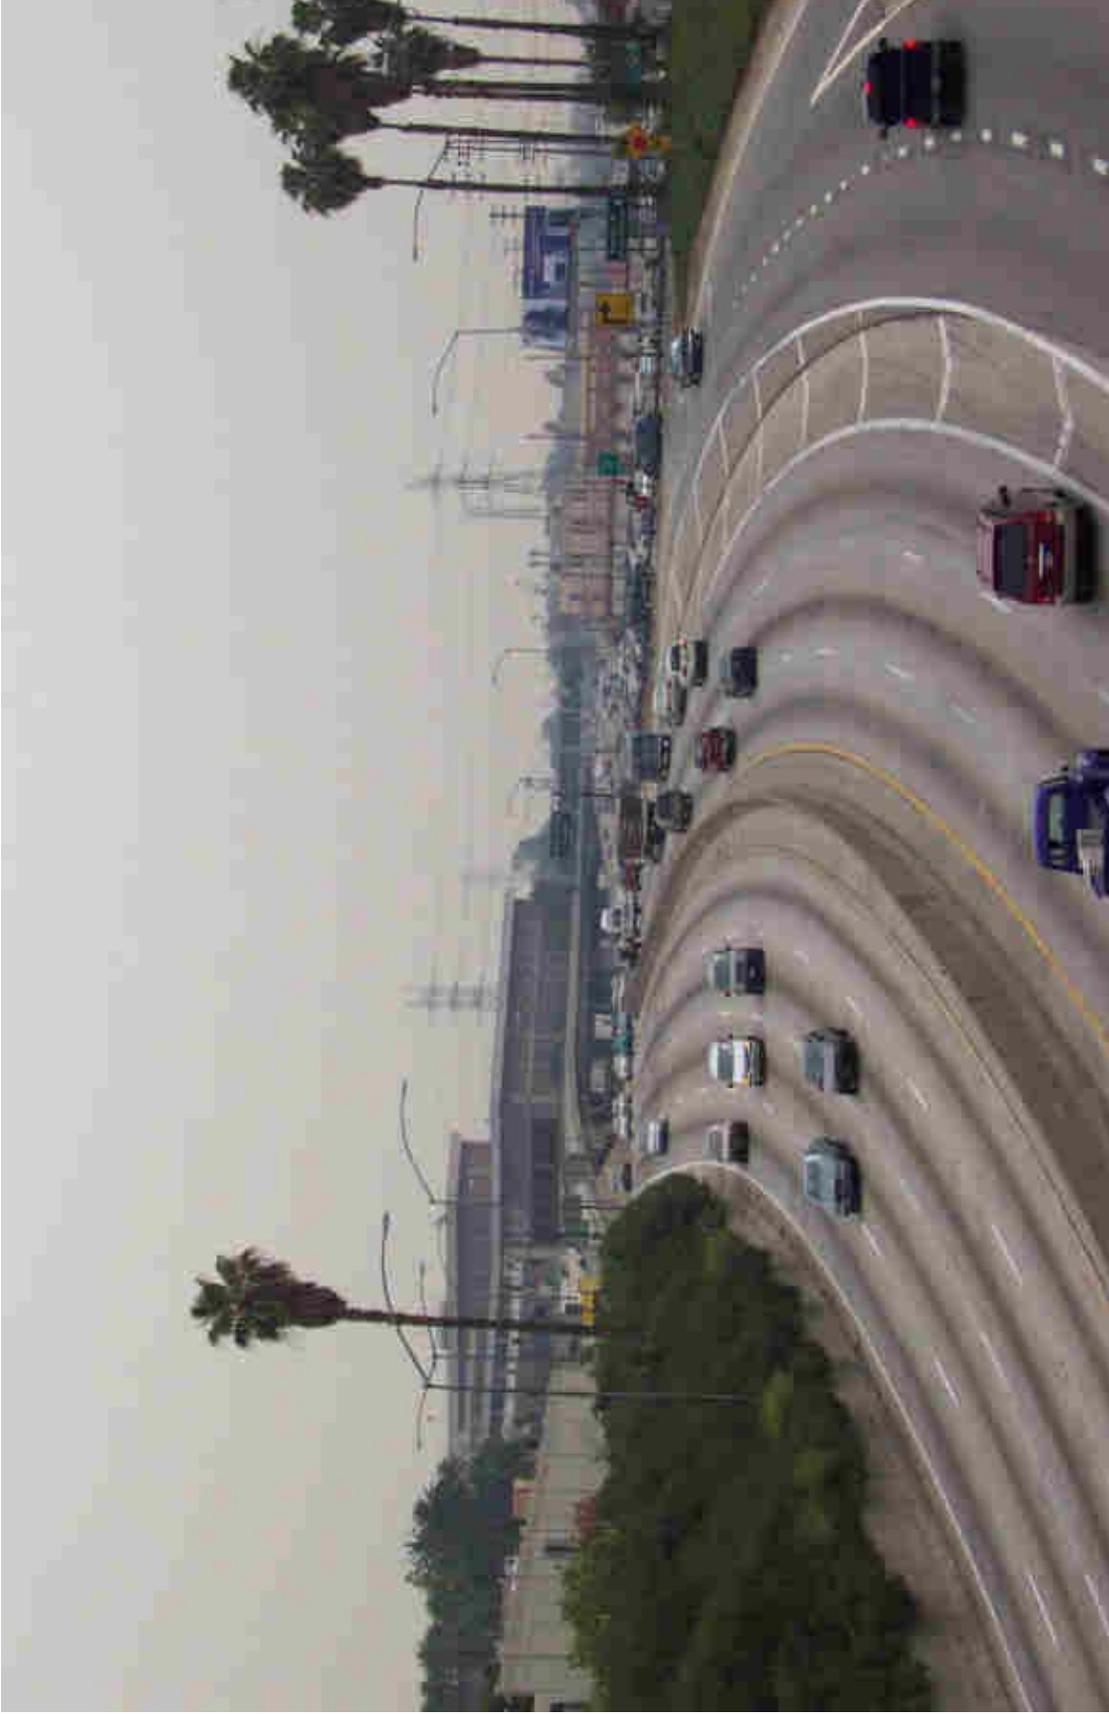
Landscape Unit C - Looking East to New Bridge Location
